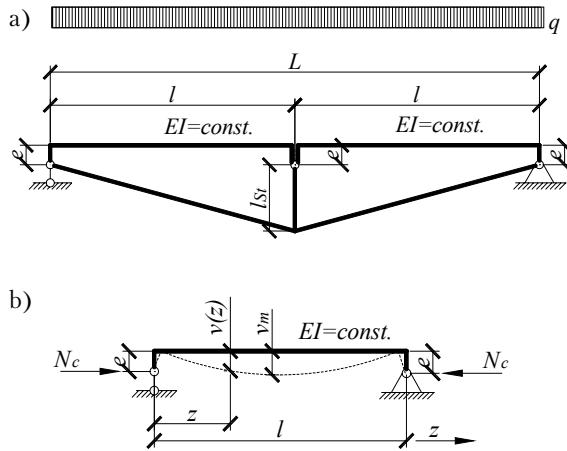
Calculation model of UDCS bridge: a) whole structure; b) individual member.
